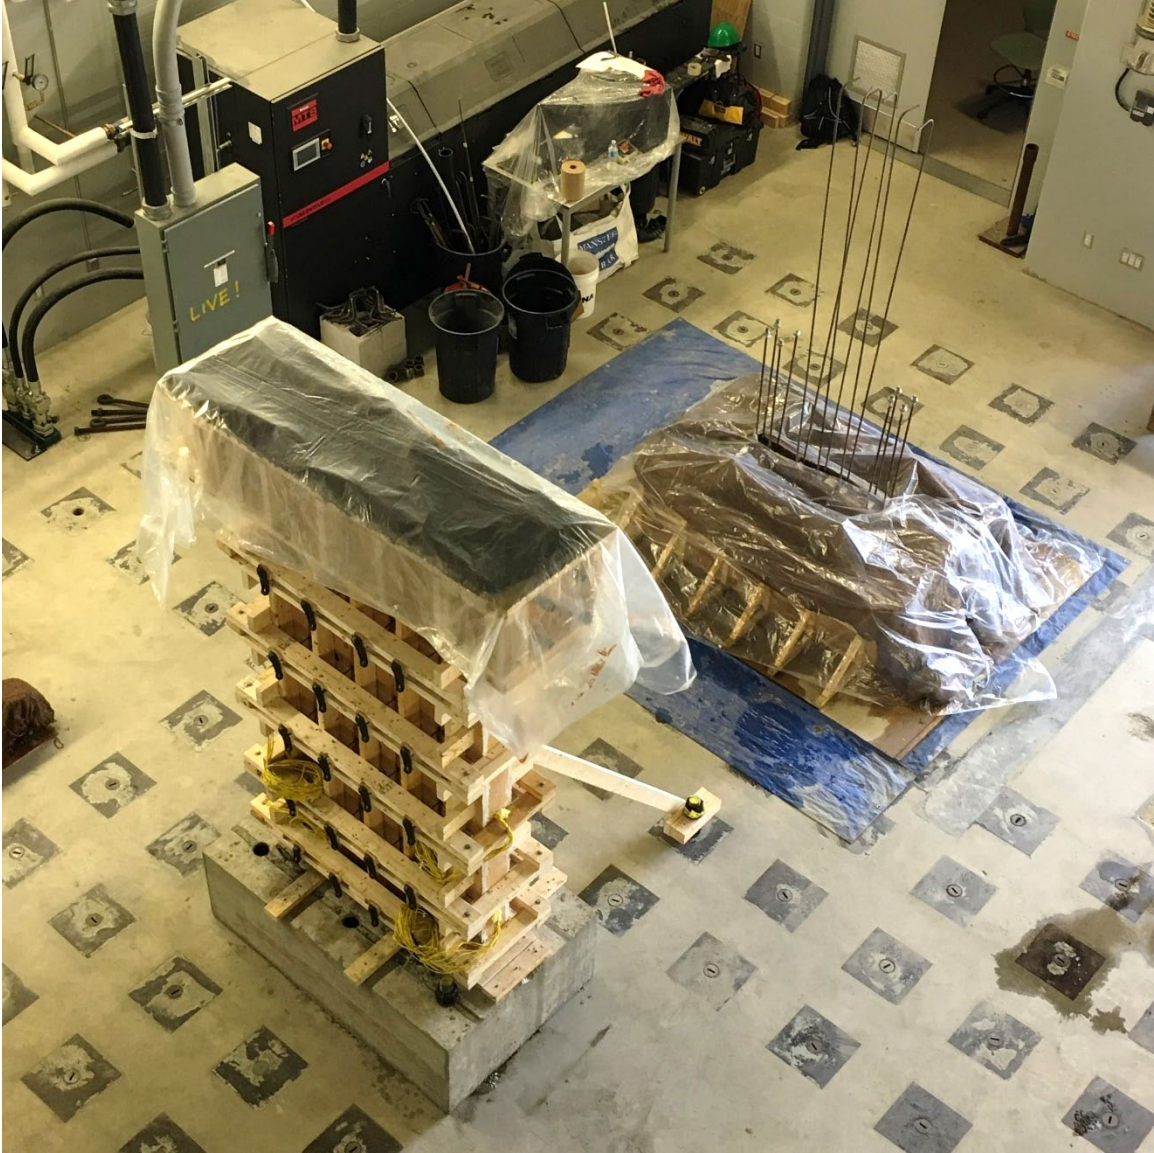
Casting and curing of walls: Wall SWS-R (left); and the foundation block of Wall SWN (right).
